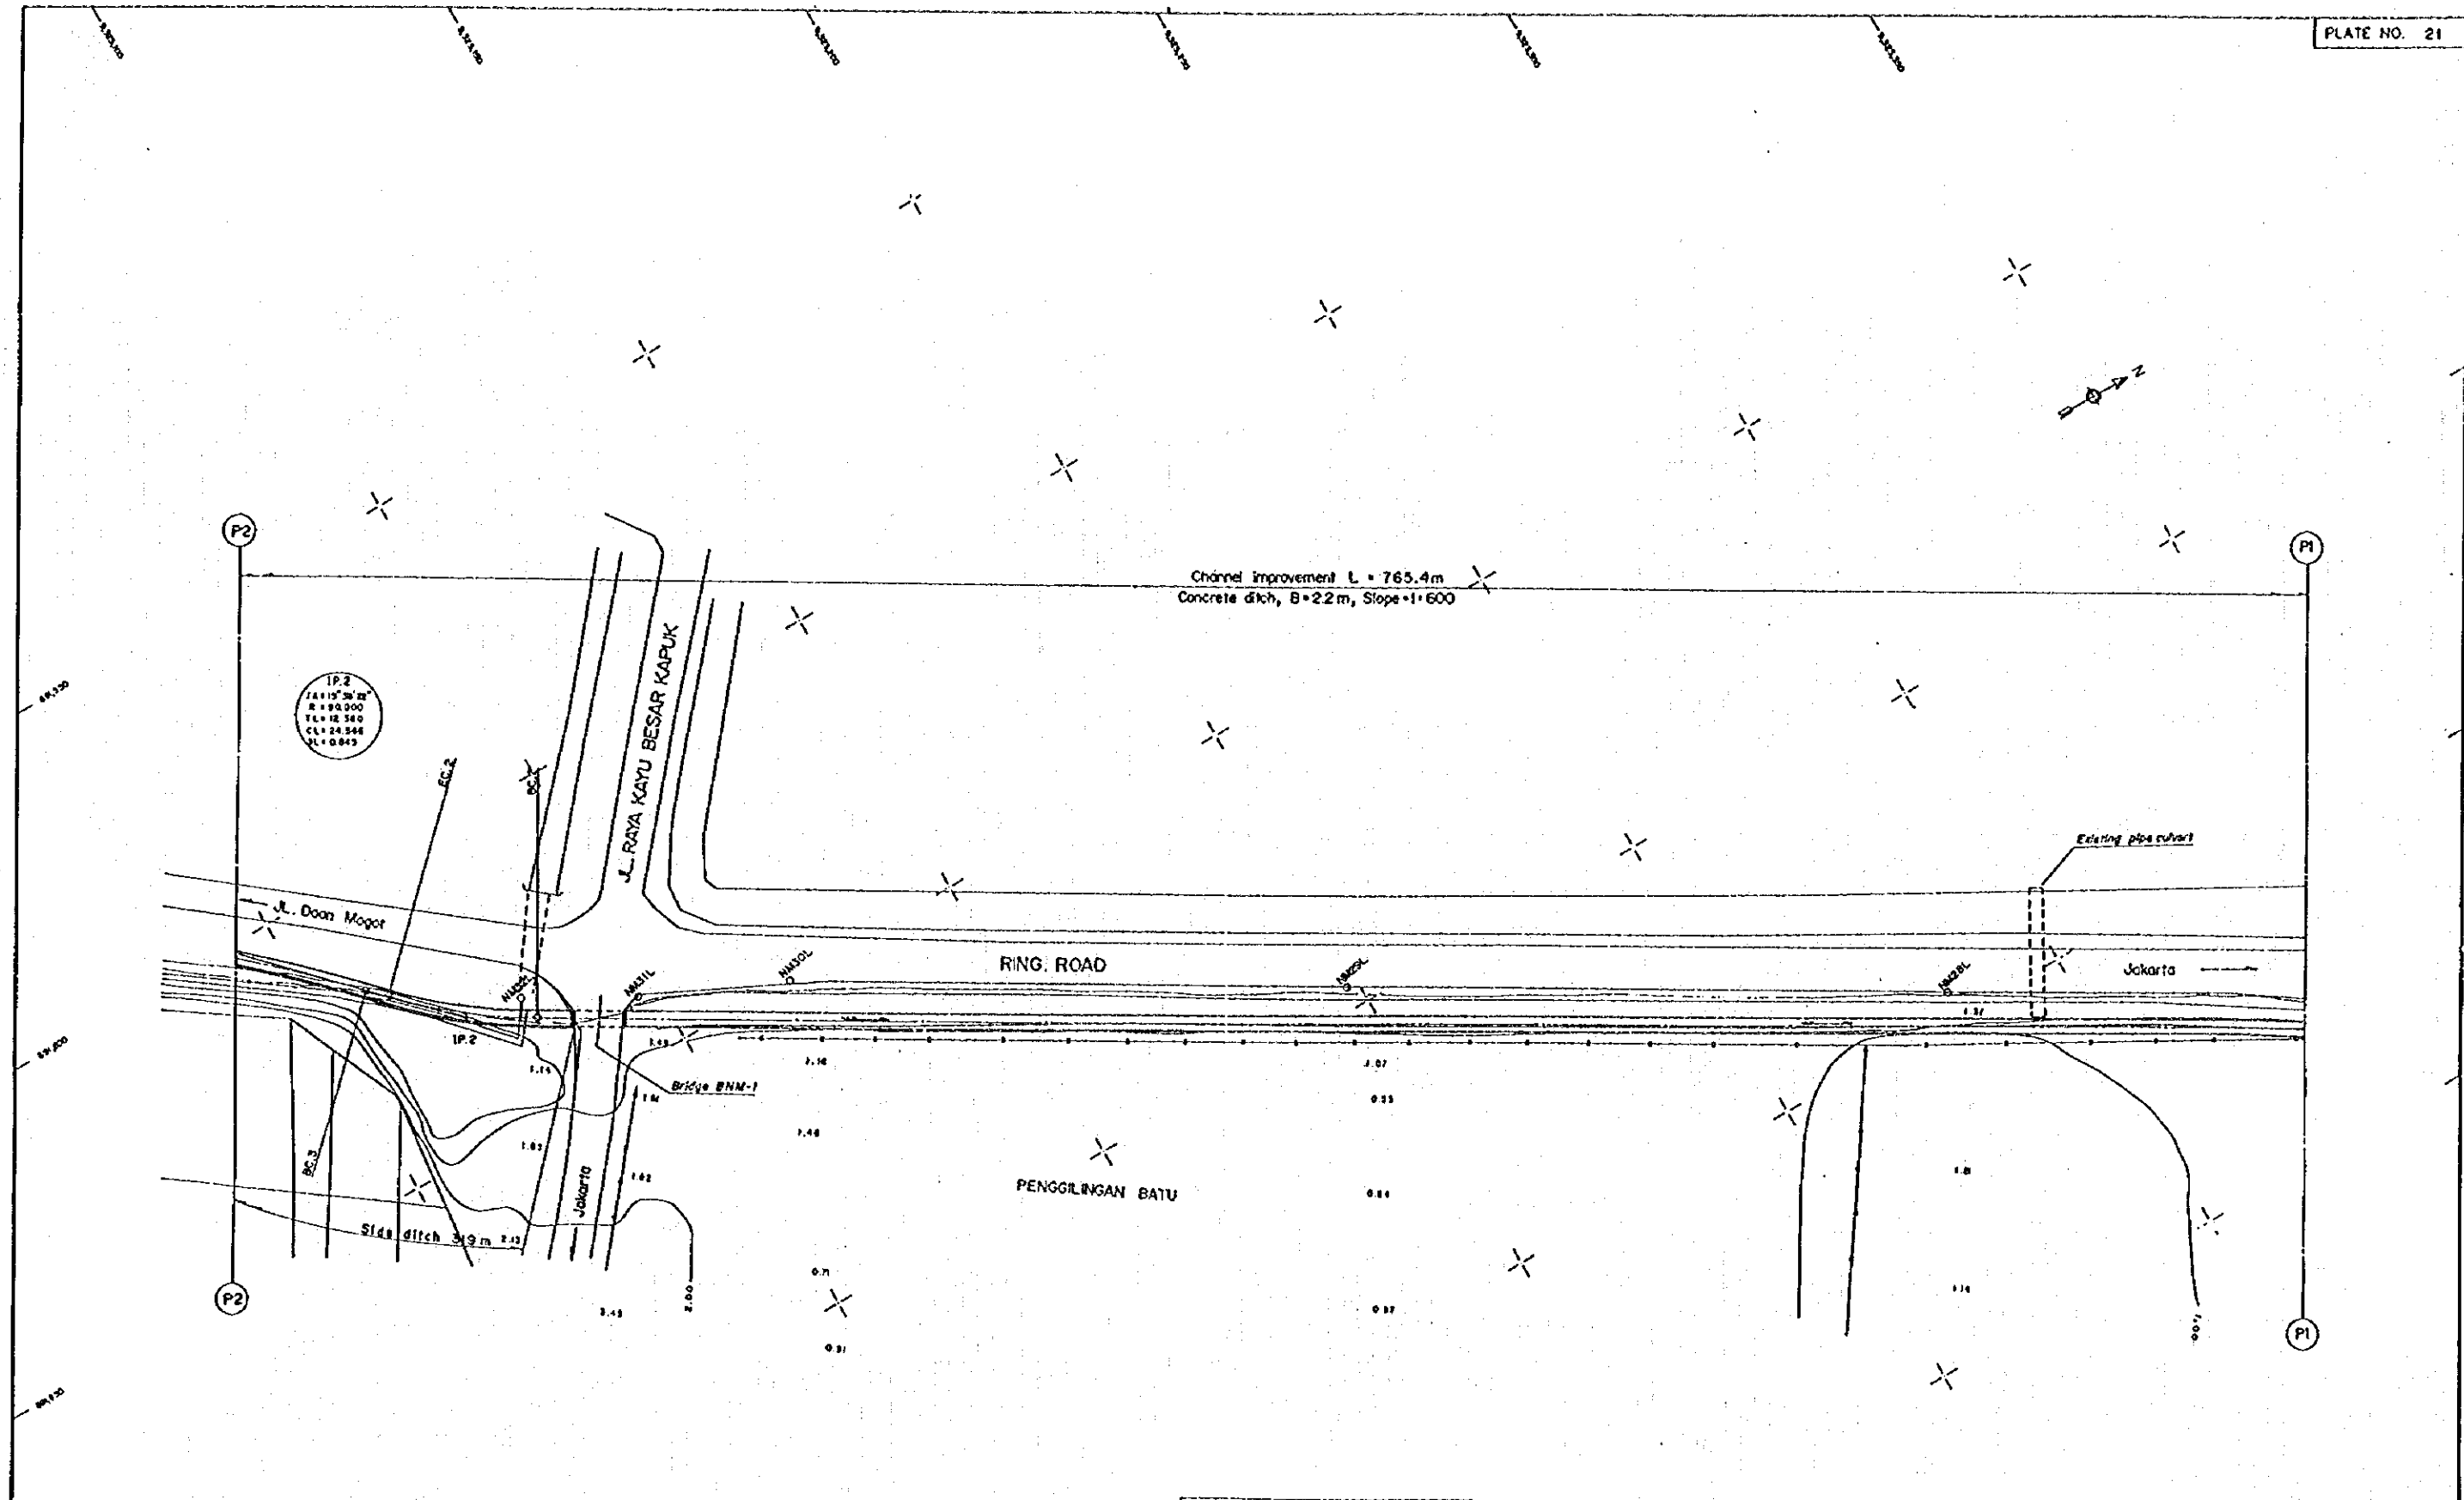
Plan of PIK Junction Drainage Channel (I)
